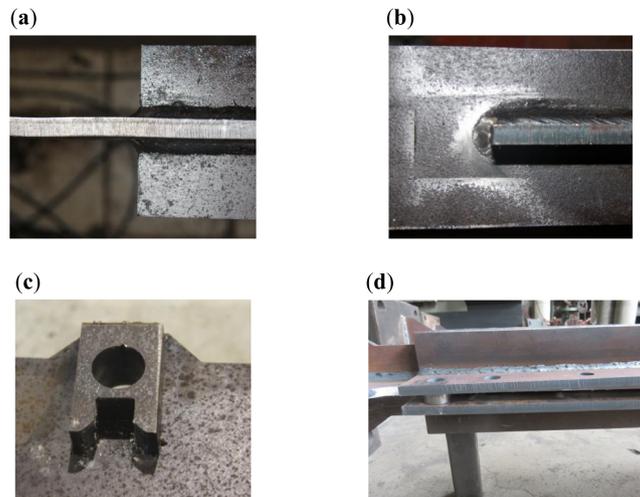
Details of the specimen: (a) smoothed weld toe; (b) smoothed weld toe from side view; (c) limit groove; (d) end of brace
